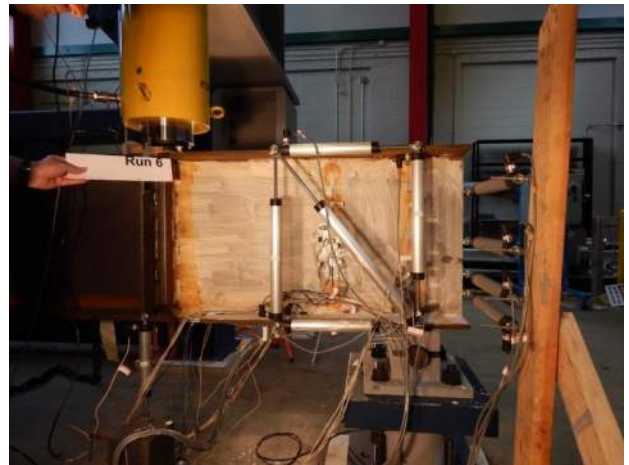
Undamaged Girder Left: 140 kip
